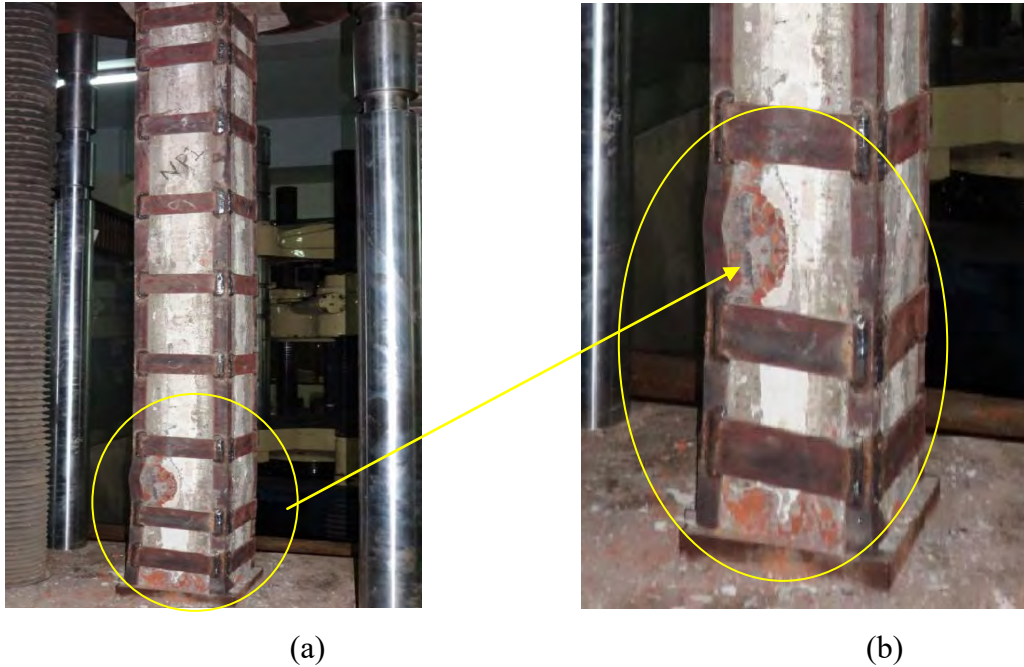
Failure mode of the partially strengthened column NS1, (a) Failure shape; and (b) Close photograph of the column NS1 shear failure.
